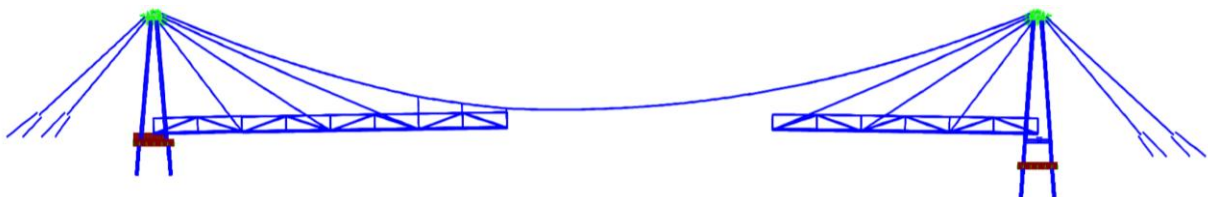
Mid-erection stage showing cantilever construction from both pylons with stay cables active, main suspension cable installed, and an initial midspan deck segment connected by vertical hangers.
